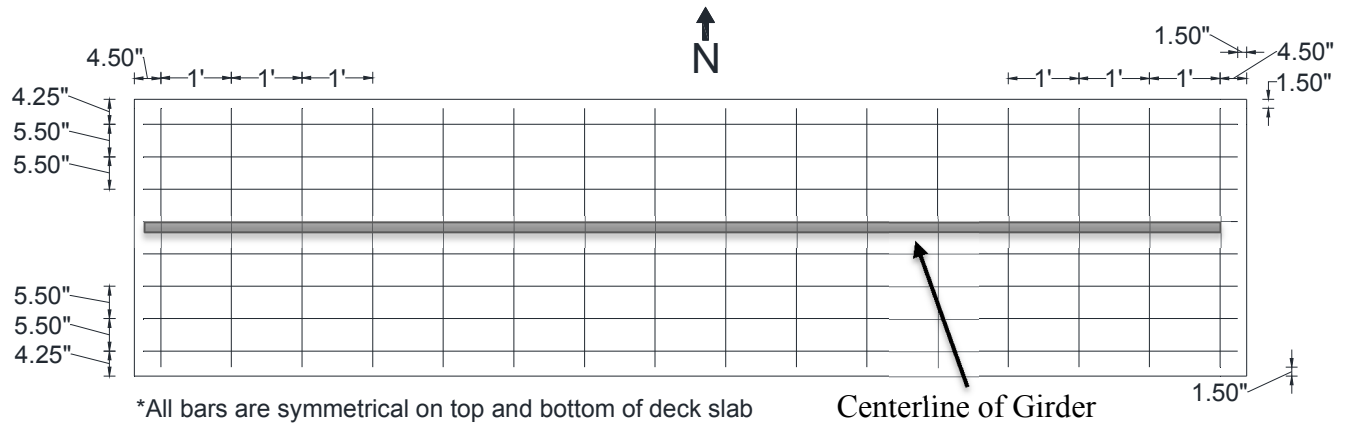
Reinforcing Steel Layout for Deck of both Specimens
